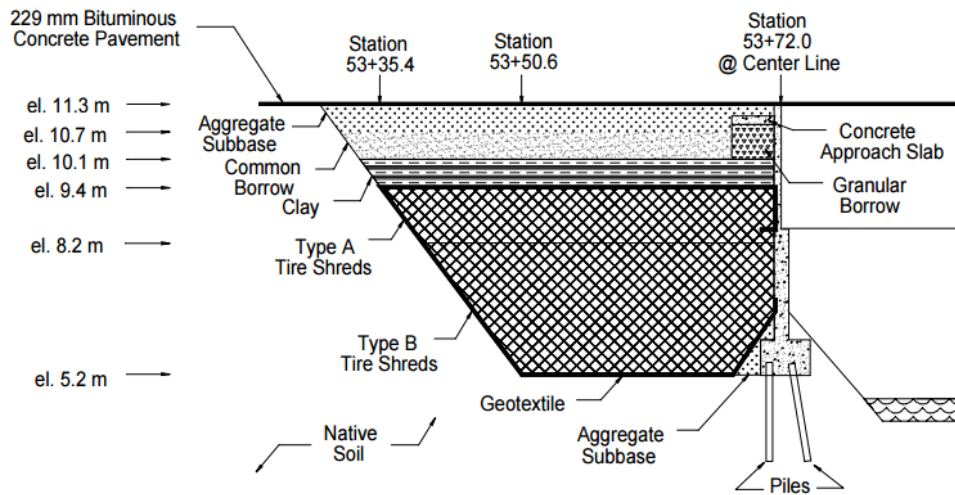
Abutment of the 300 m long Merrymeeting Bridge (after Humphrey et al. 1998)
